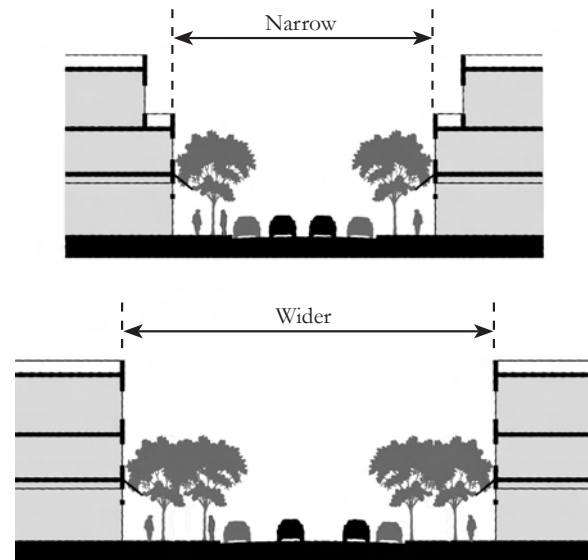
Buildings should not overwhelm the pedestrian experience on the street and should account for the relationship between building height and street width.
